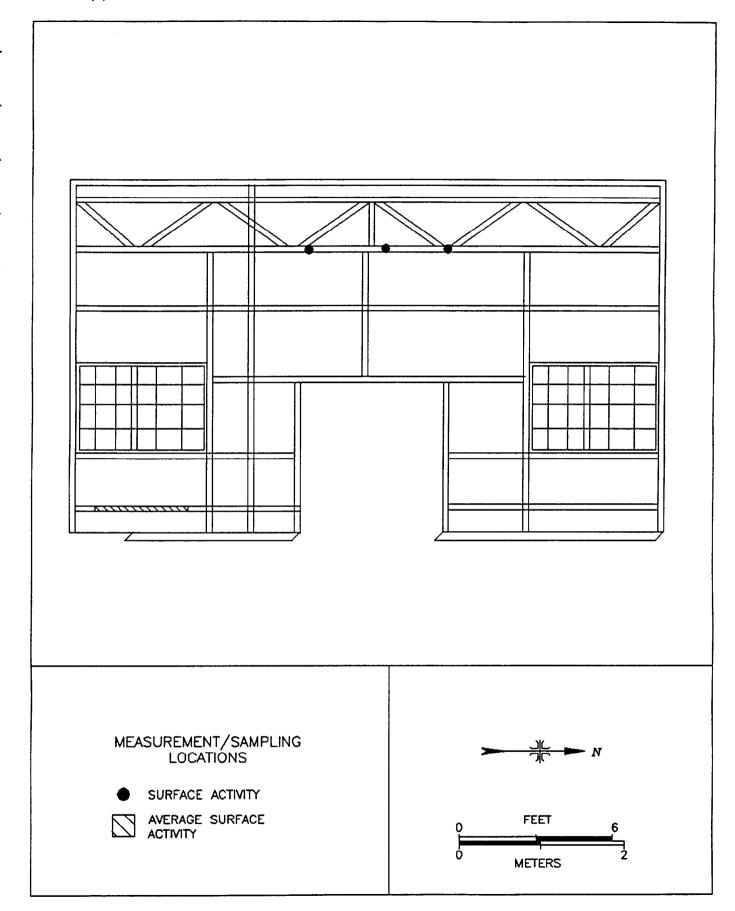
Building 8, Room B, West Wall — Measurement and Sampling Locations
